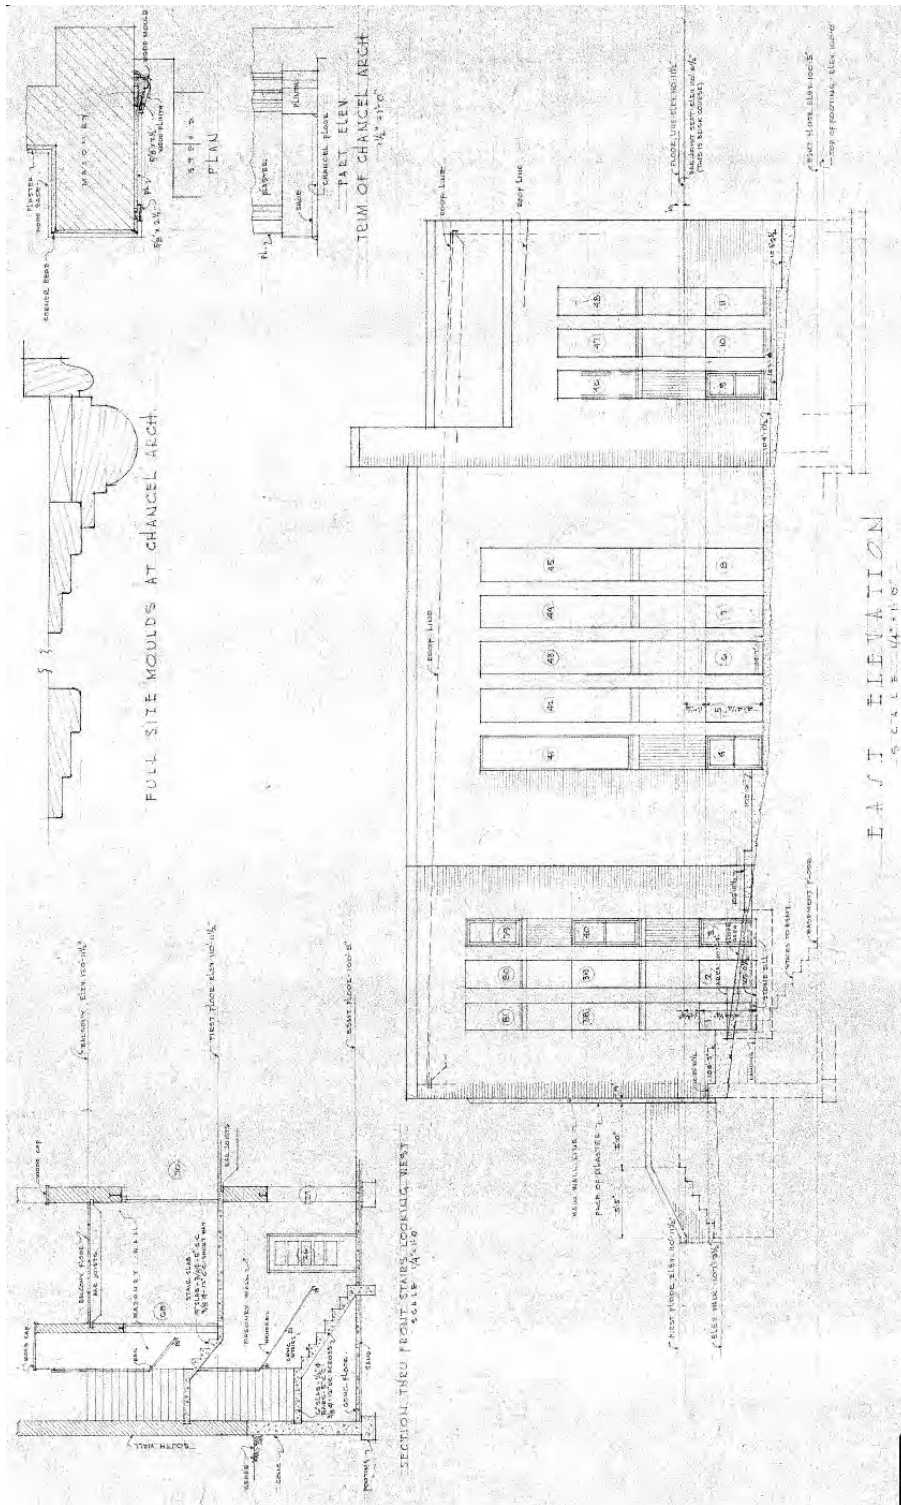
East elevation from plans drawn by David B. Toenjes.
